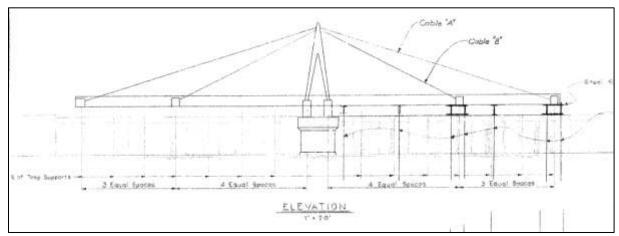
Meridian Bridge elevation drawing.⁷⁴
